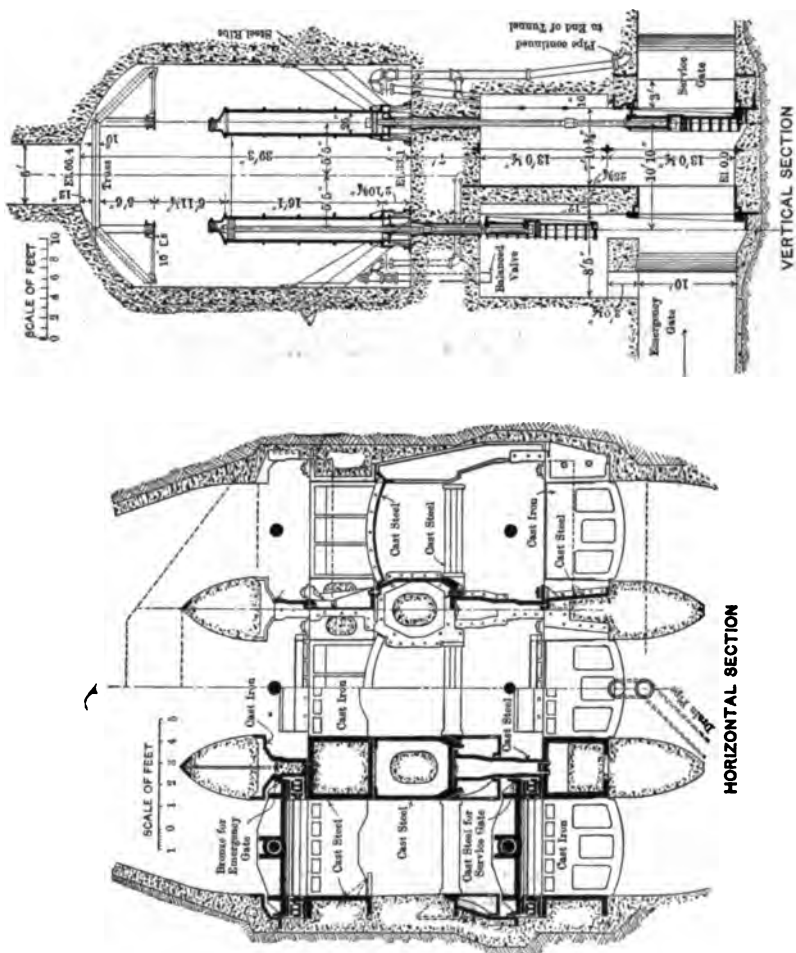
PLATE XXXVIII.—Outlet Gates, Roosevelt Dam, Arizona.
